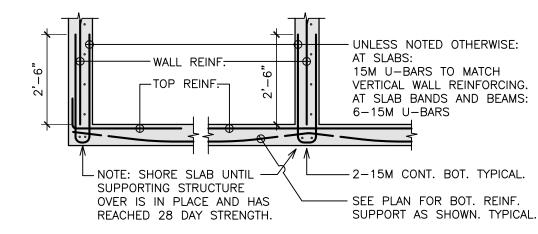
DETAILS OF HORIZONTAL REINFORCEMENT AT CORNERS SEE ALSO ZONE REINFORCING DETAILS)
